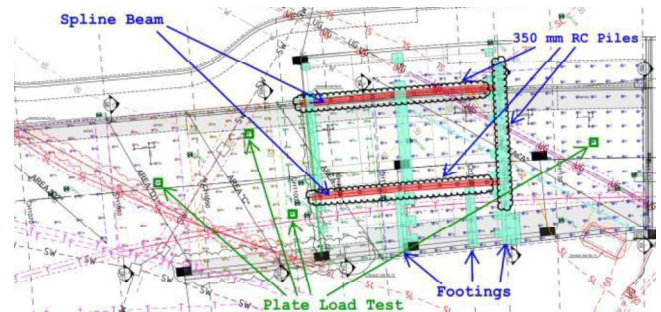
Rigid inclusions and spline beam layout for the western approach embankment
